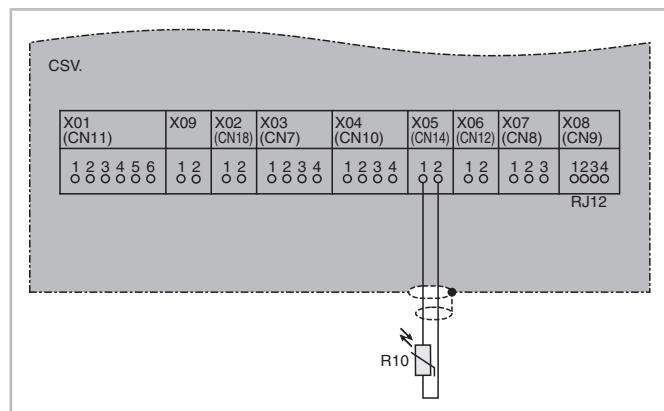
Electrical connection of the optional temperature sensor R10 to terminal strip X05 (CN14) which is part of the control board located in the lower part of the FI housing
